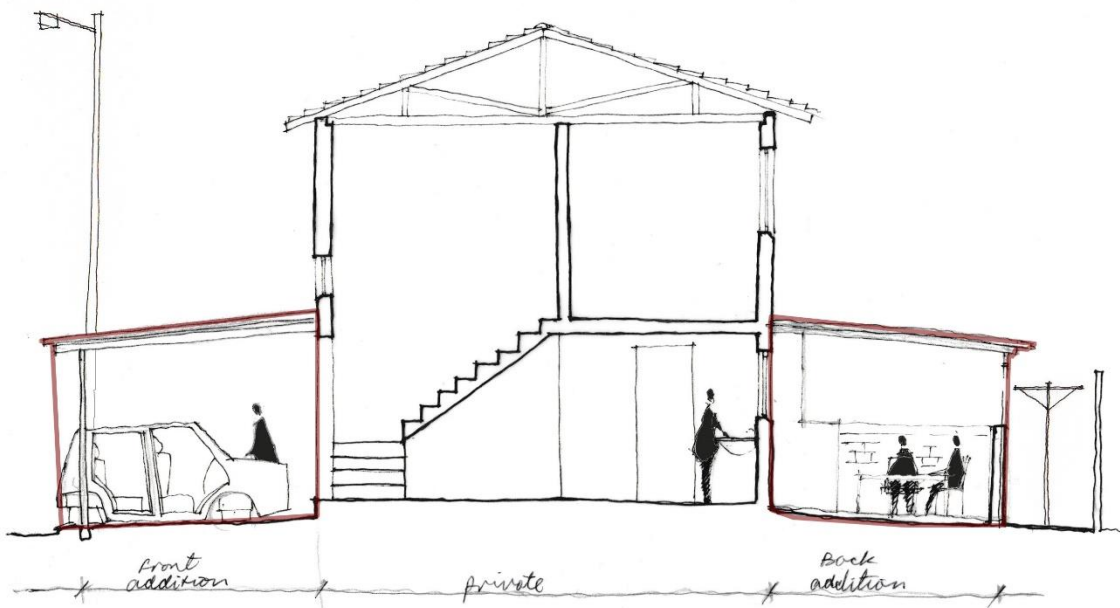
Field drawings. Typical House Section showing front and back additions. Source: Author, 2016
